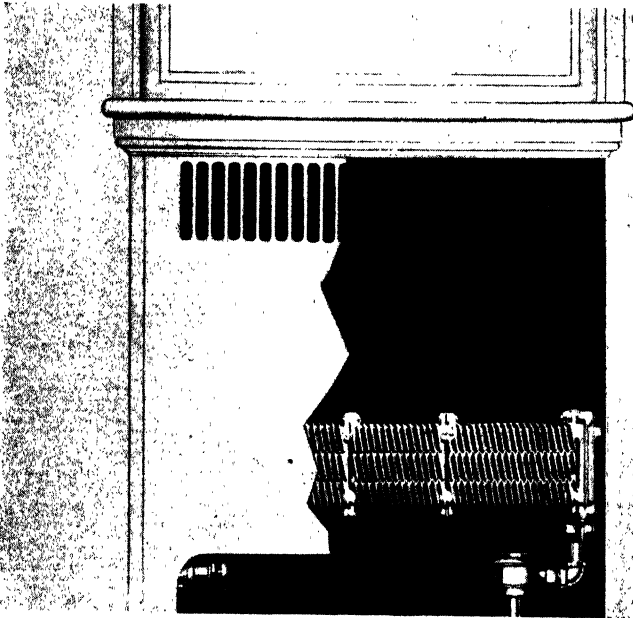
Cast-iron extended-surface convector. (*American Radiator & Standard Sanitary Corporation.*)
